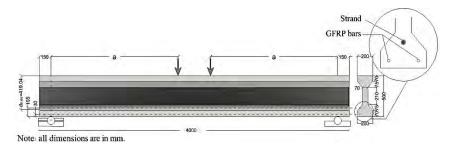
Beam configuration and test setup (dimensions in mm)
